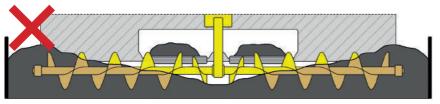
Too large material feed from the augers and/or too little material feed from the conveyor belts
